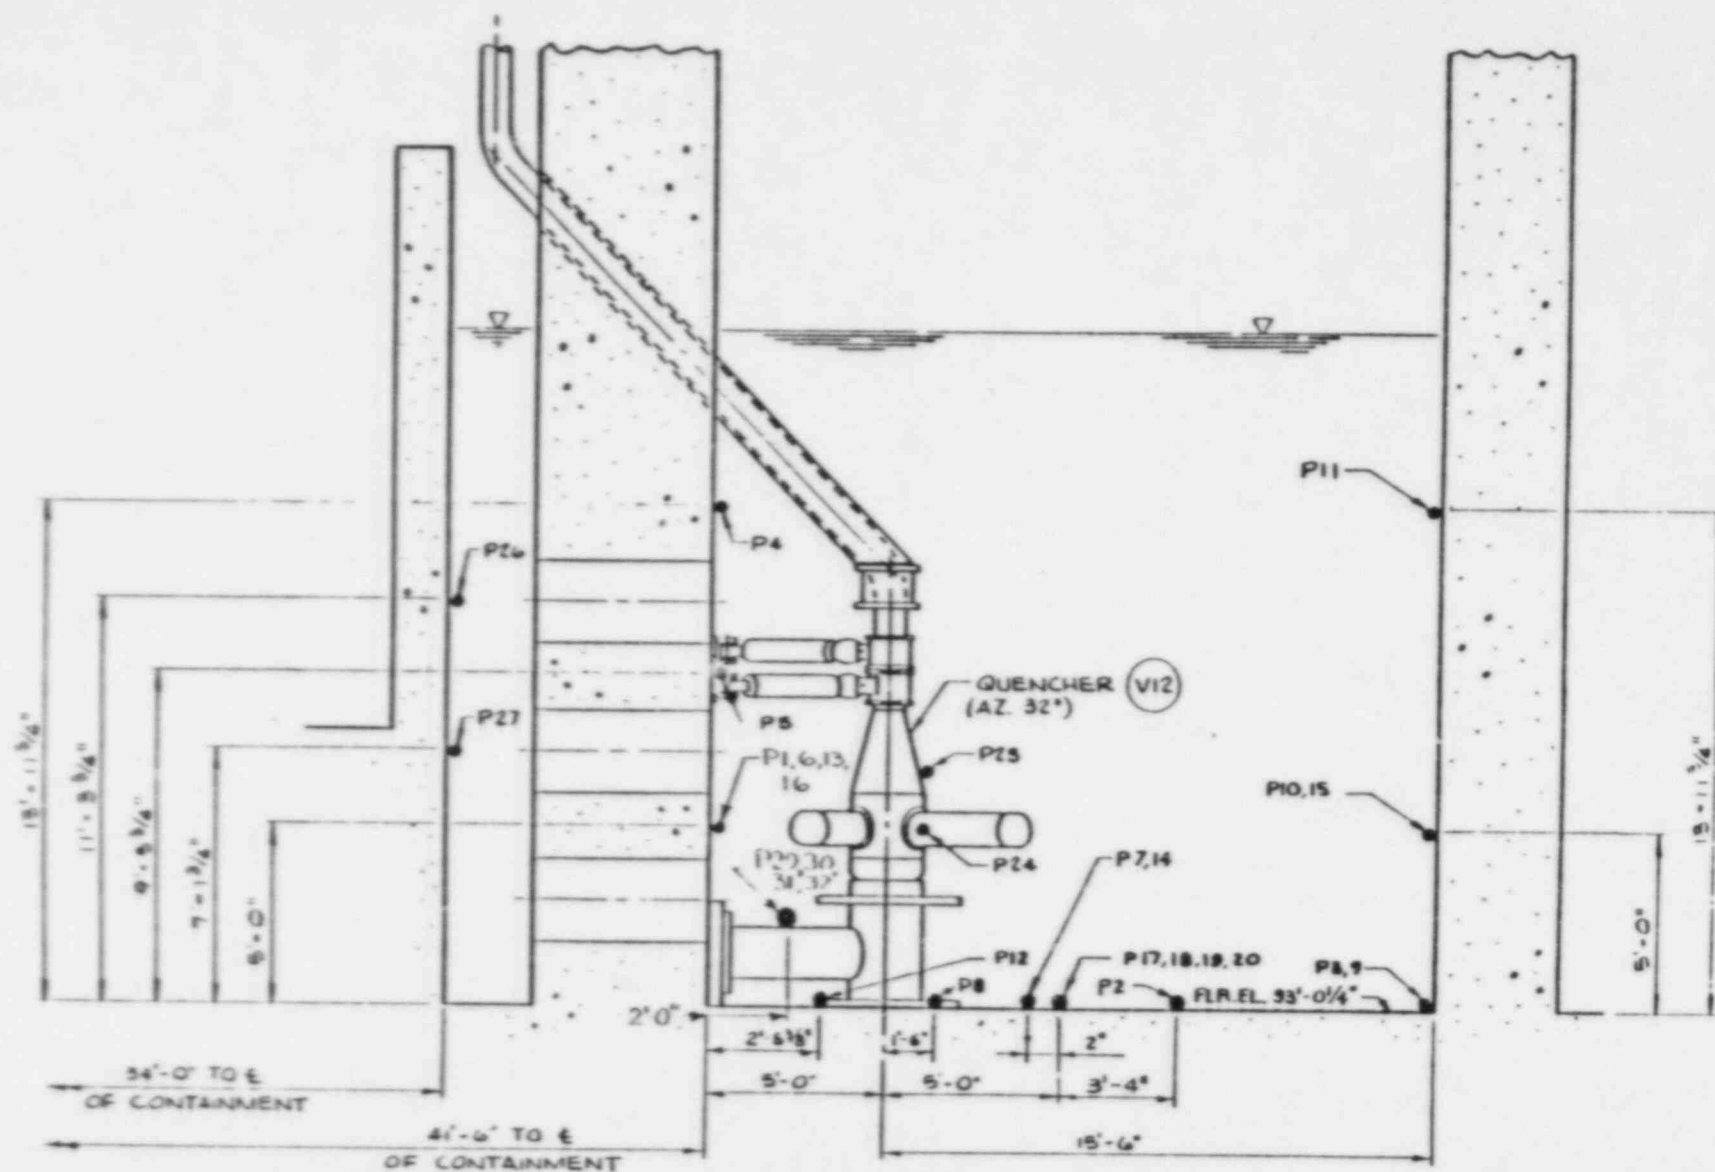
Suppression Pool Pressure Transducers - Elevation View
